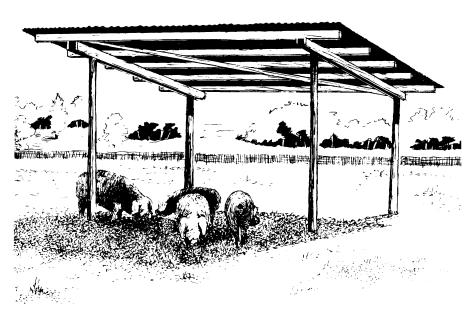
Permanent-type hog shade and construction details—12 by 16 feet.
